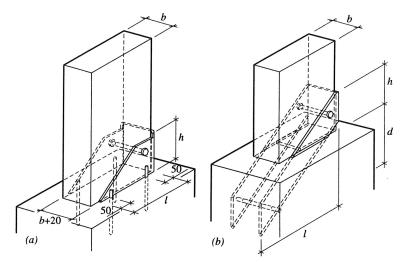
Column supports or supports for light frames and arches based on steel plates.
